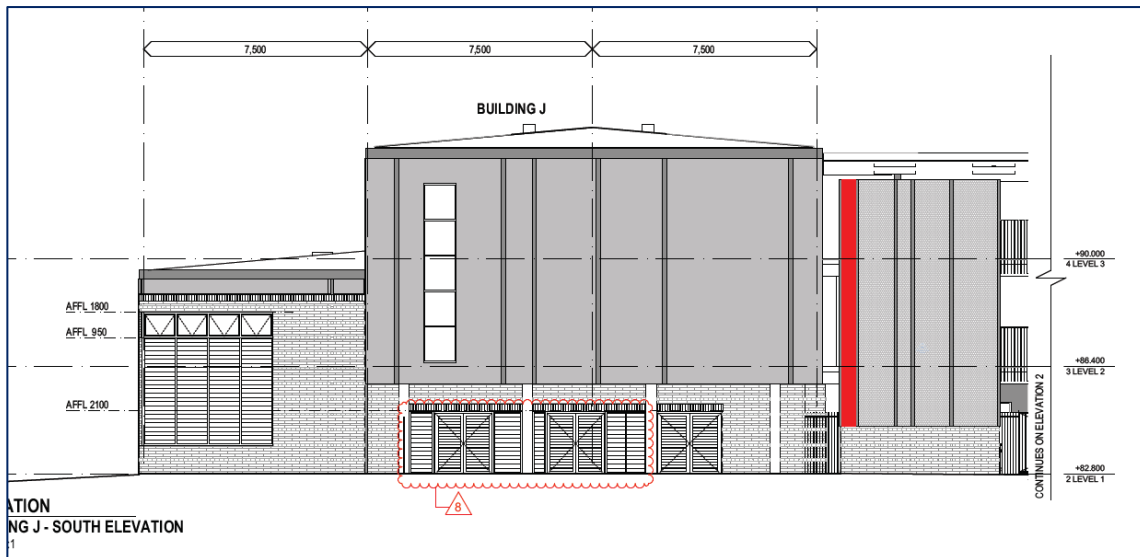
| Modification to louvre doors on southern elevation of Building J outlined in red (Source: Applicant's Modification Application 2022)
